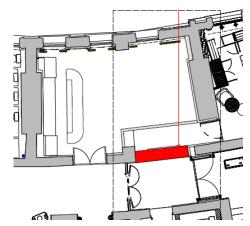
extract from proposed first floor plan (ref: 2474.PL.013)
